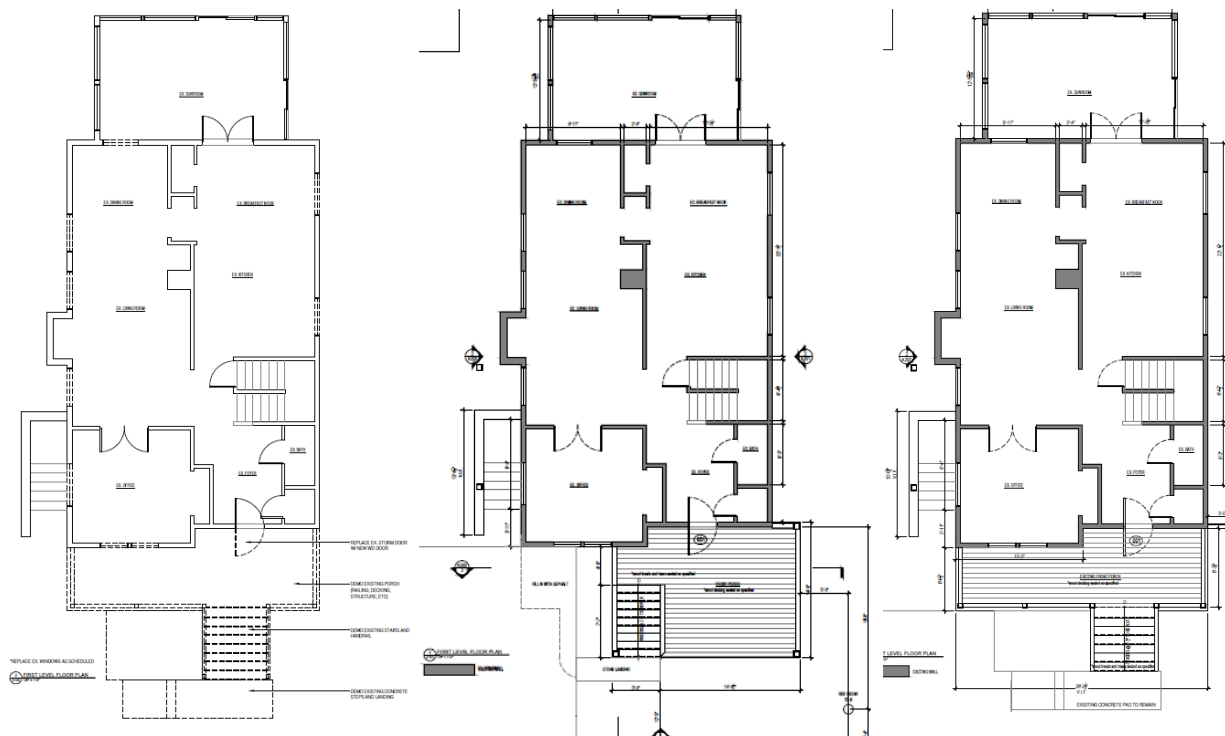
Existing first-floor plan (left) and previously-approved first-floor plan (center) and revised first-floor plan (right).
